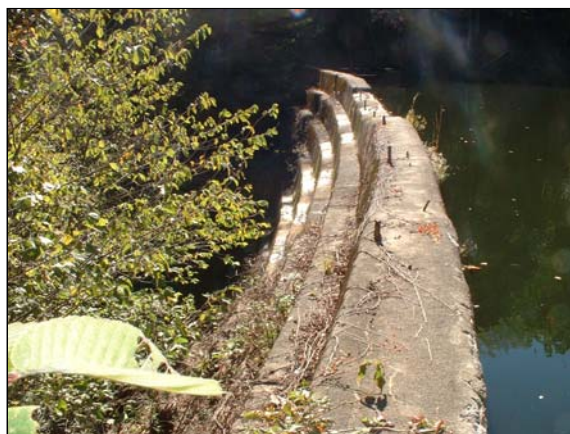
A concrete arch-shaped gravity dam in Indiana.
